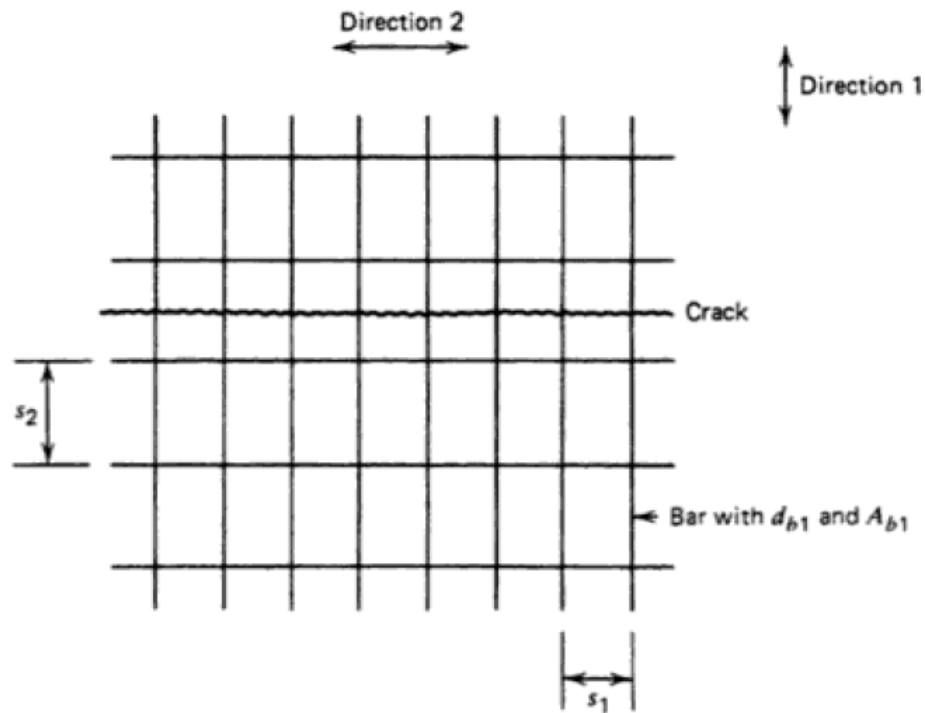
Steel Arrangement for Determination of Grid Index
